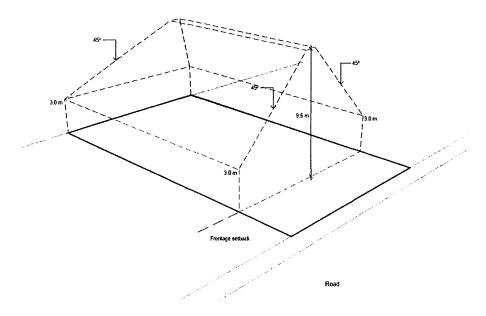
Building envelope as required by clause 9.4.2 A3(a) and clause 9.5.1 A2(a)
